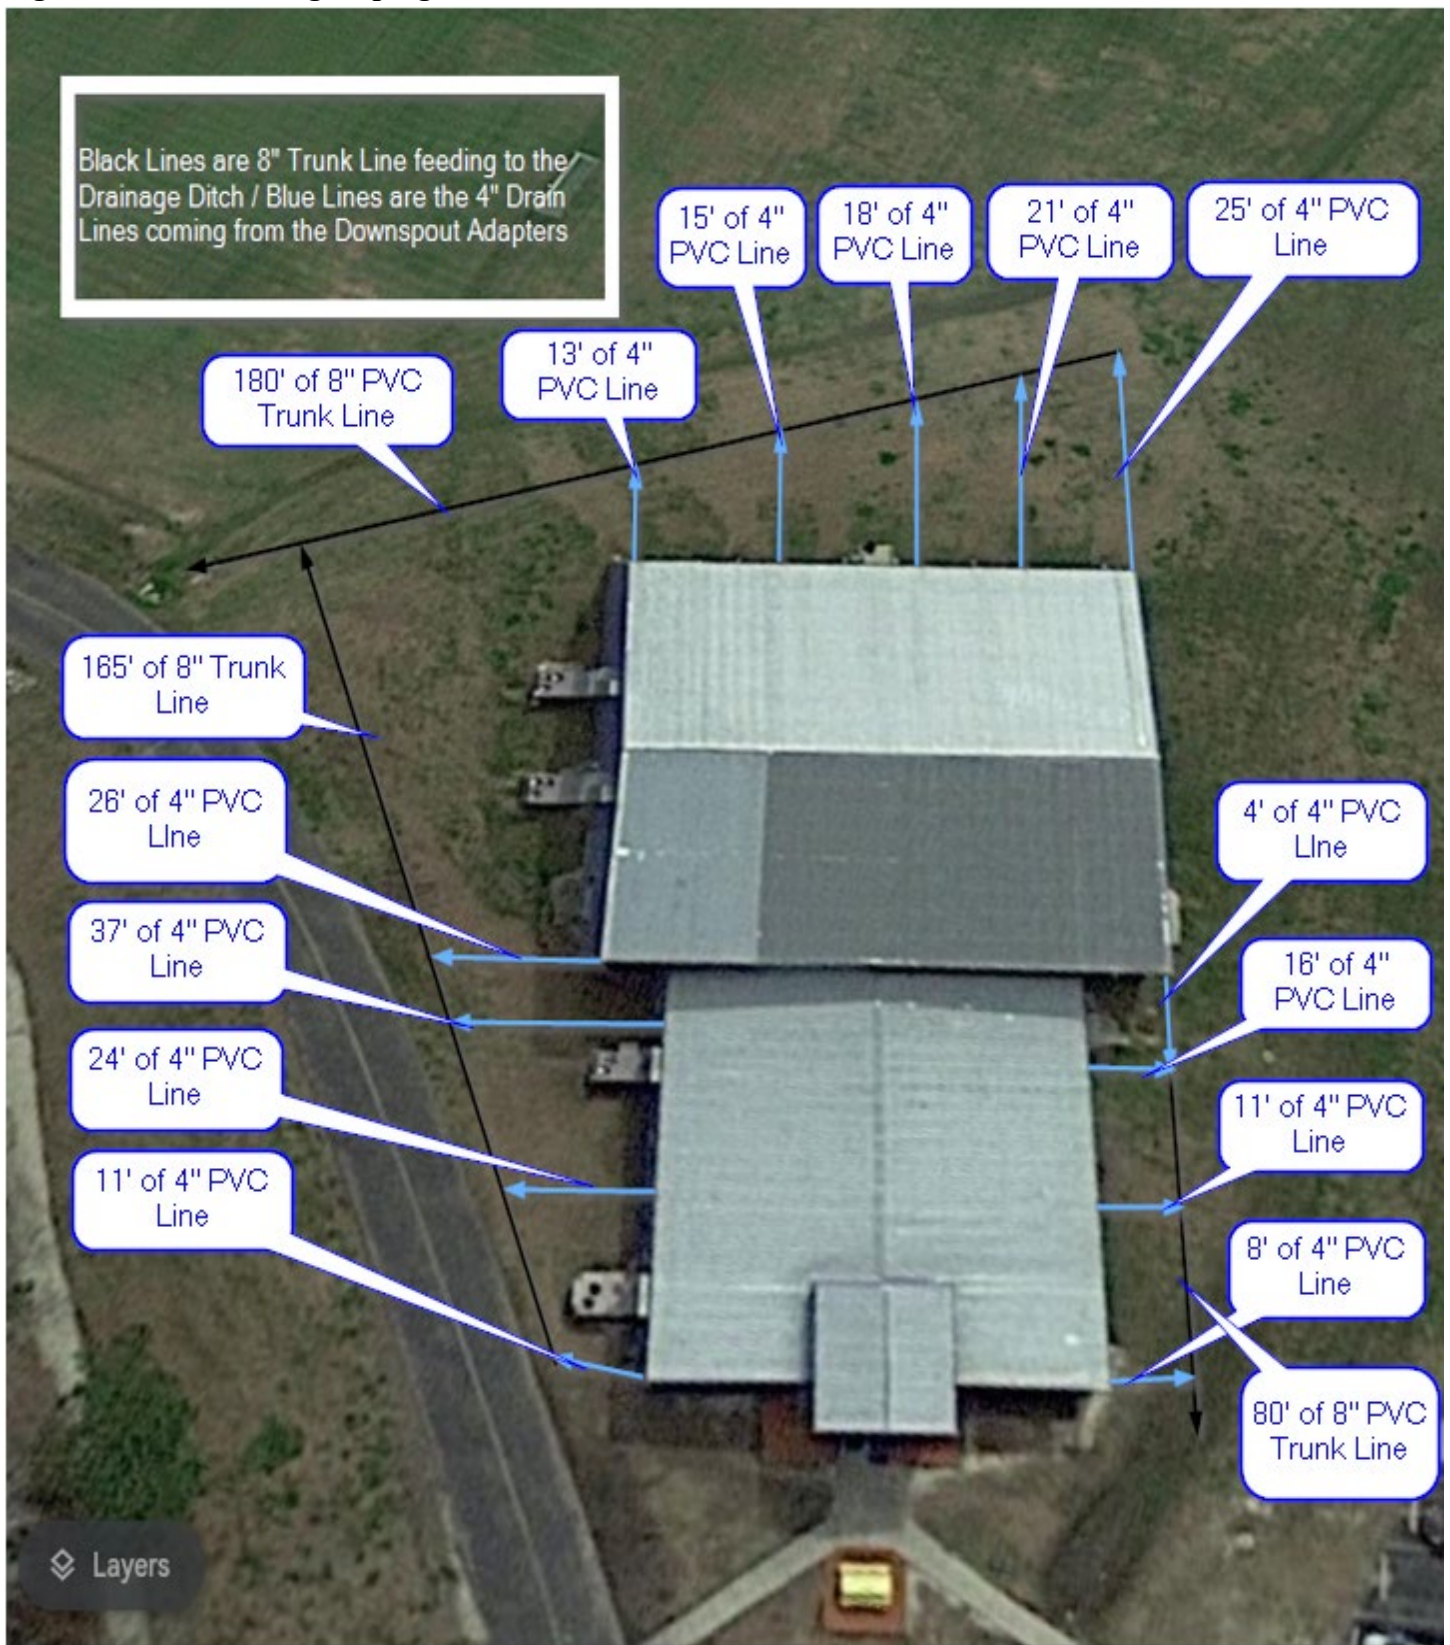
Drainage Piping to be replaced and ditch shall be set at a 0.3% grade.
